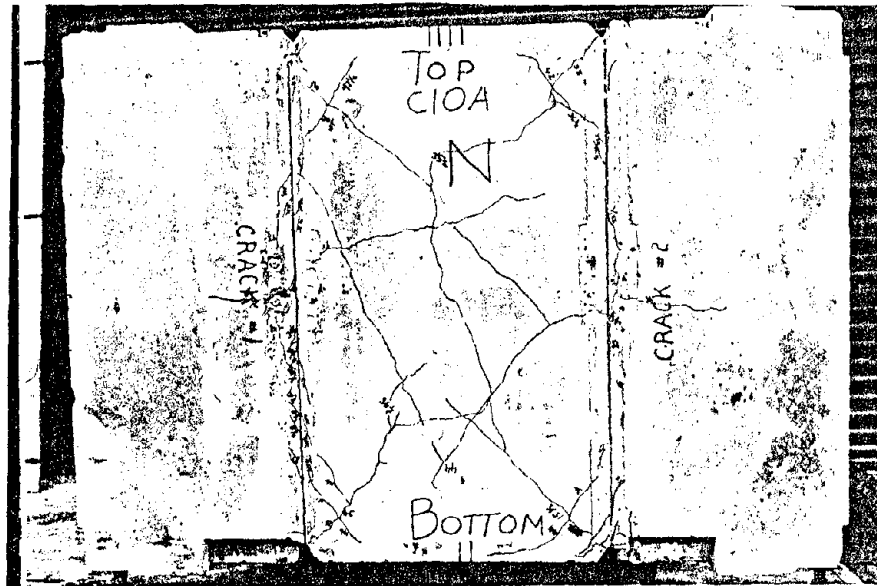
Typical appearance of a cyclic loading specimen after failure
